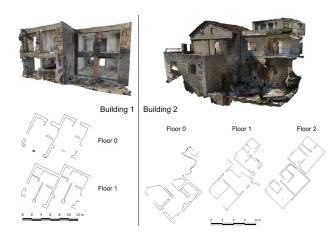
Textured 3D mesh of the two buildings and the extracted floor plans per building. The floorplans were extracted
